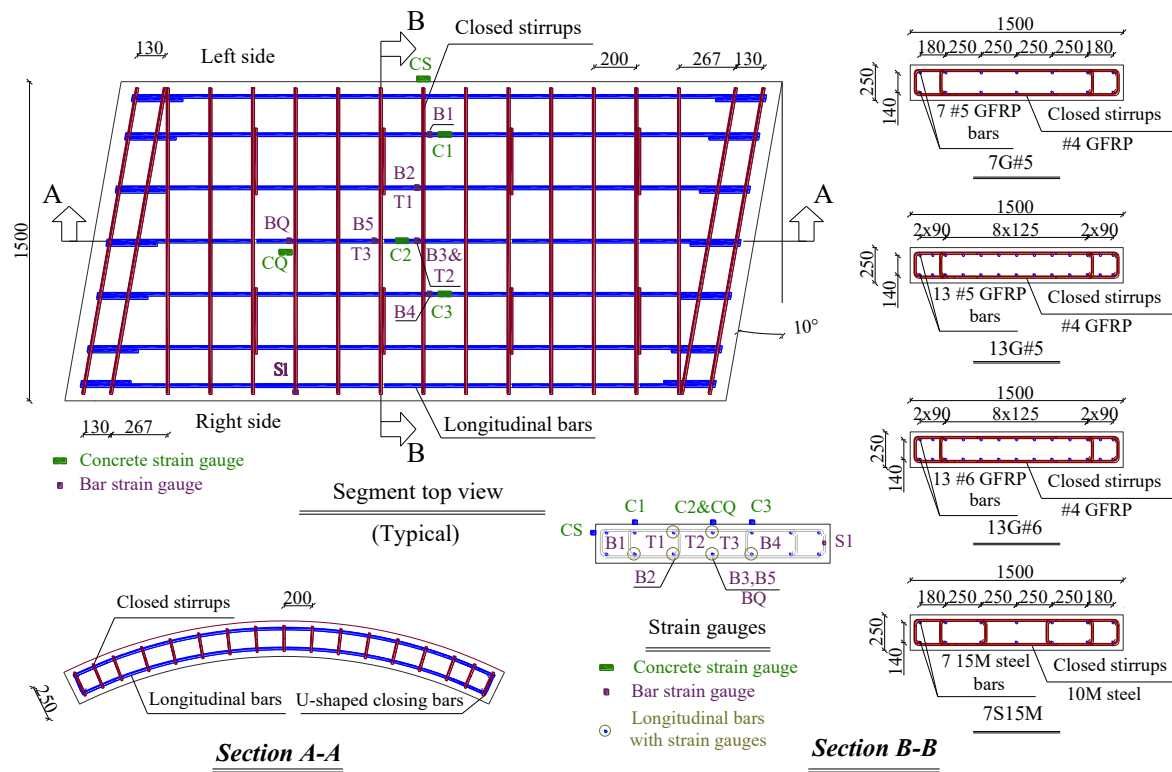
Details of reinforcement, geometry, and strain gauges. (Note: All dimensions in mm; 1 mm = 0.0394 in.)
